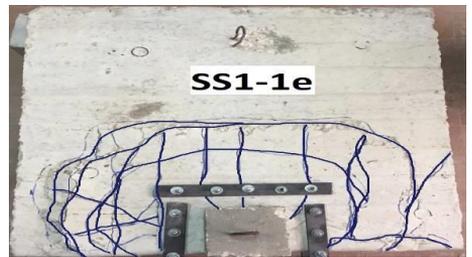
Pattern of cracking for specimen (SS1-1e).
